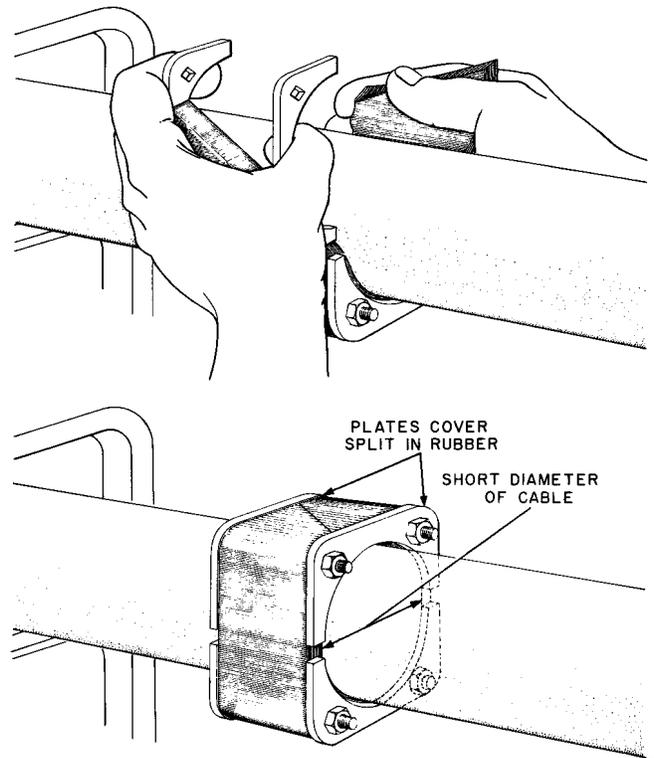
Placing Split Rubber Conduit Plug on Cable
